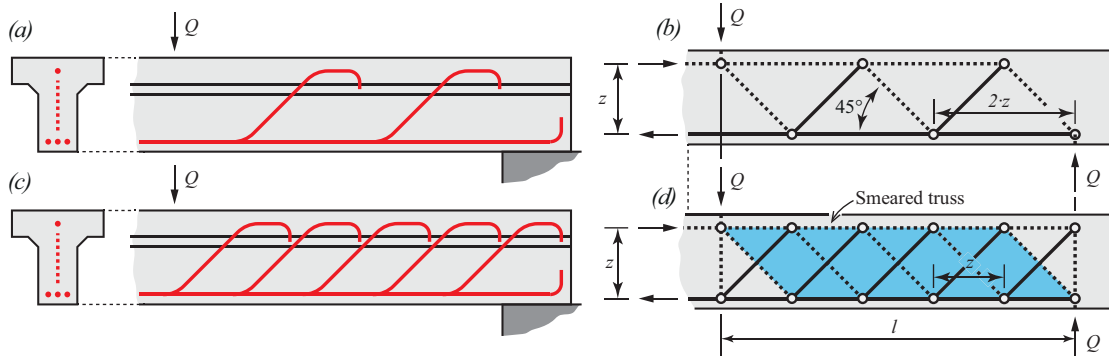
(a) RC beam with inclined rebars tested by Mörsch; (b) truss model of a beam with inclined rebars; (c) RC beam with closely spaced inclined rebars tested by Mörsch; (d) smeared truss model for beams with inclined rebars
